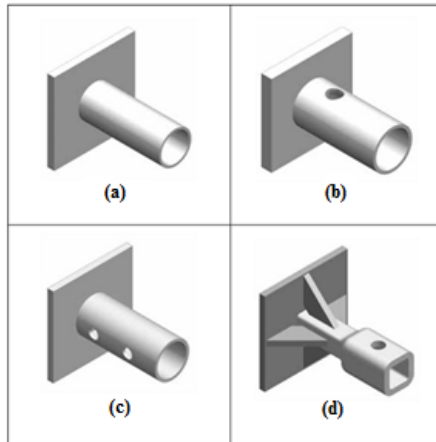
3 Different commonly used new construction bracket in the new foundations construction (Hubbell Power Systems Inc., 2014)
